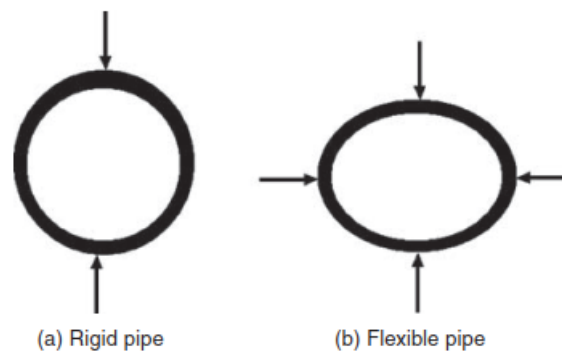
Load transfer mechanisms for rigid and flexible pipes. (Source: Najafi, 2010)
